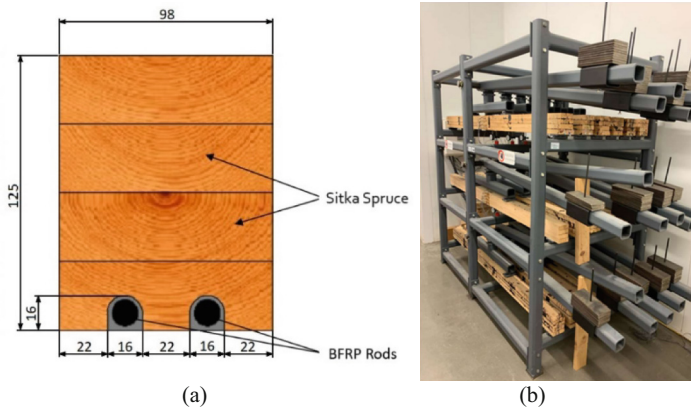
Creep Testing, (a) FRP reinforced glued laminated beam [22] and (b) the creep testing frame.
